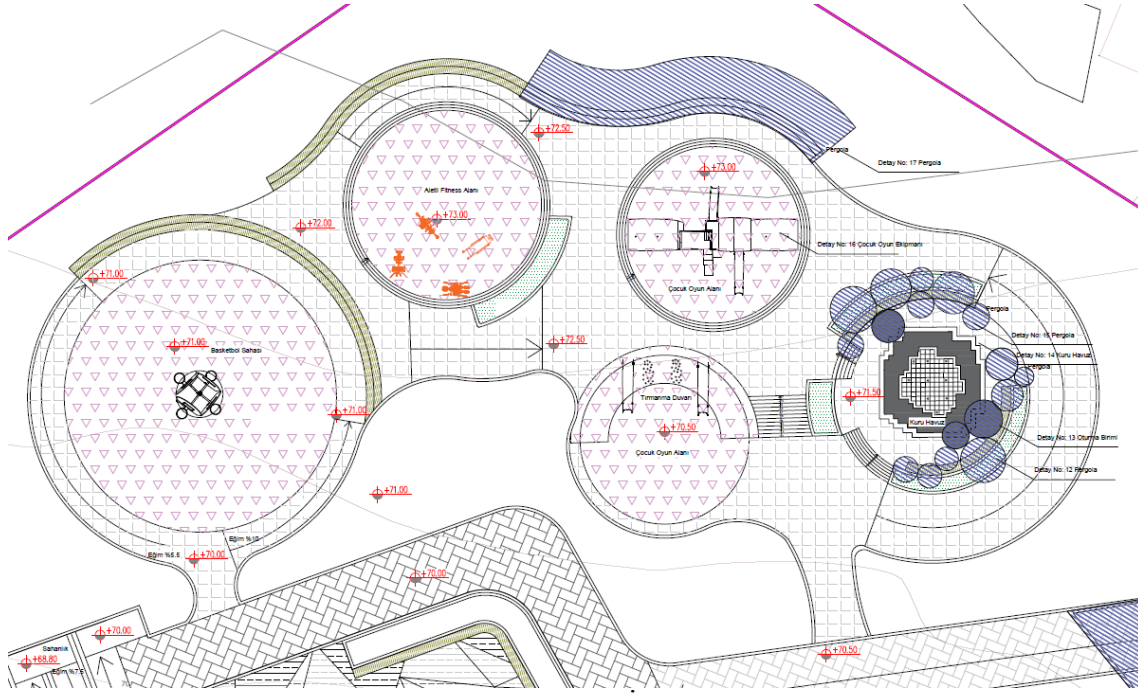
Site Plan Detail (Created by İlayda Arslan usign Autocad 2022)
